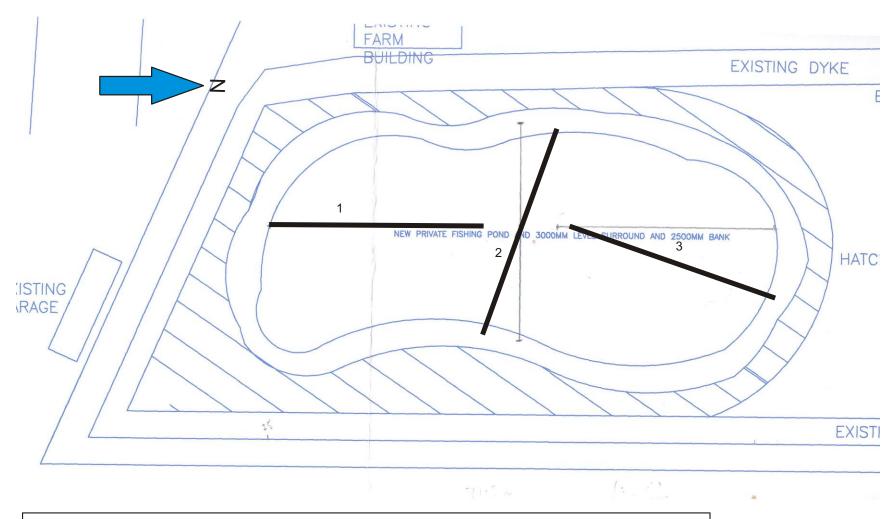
Plan of the proposed layout of trial trenches, at an original scale of 1:500 (extract from Architects plan)
